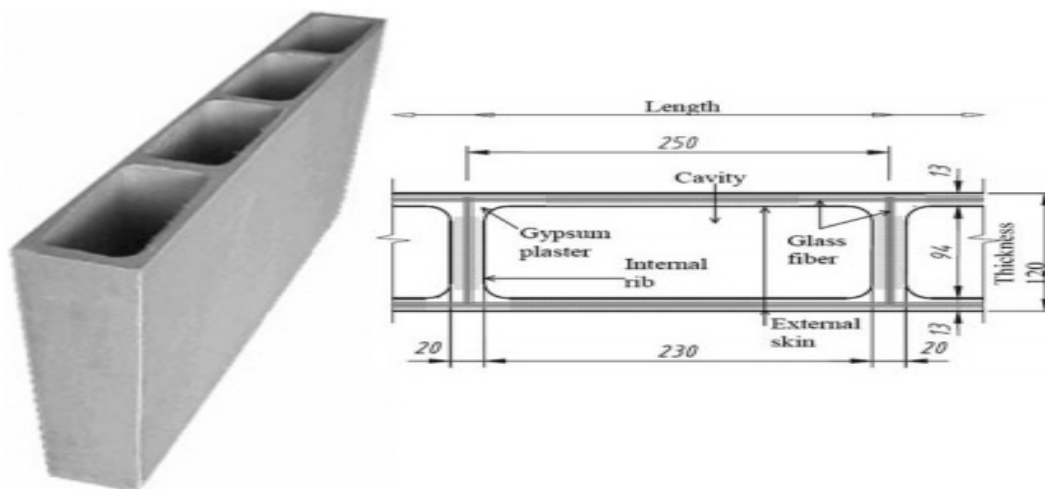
Glass Fibre Reinforced Gypsum wall panel section (GFRG)
